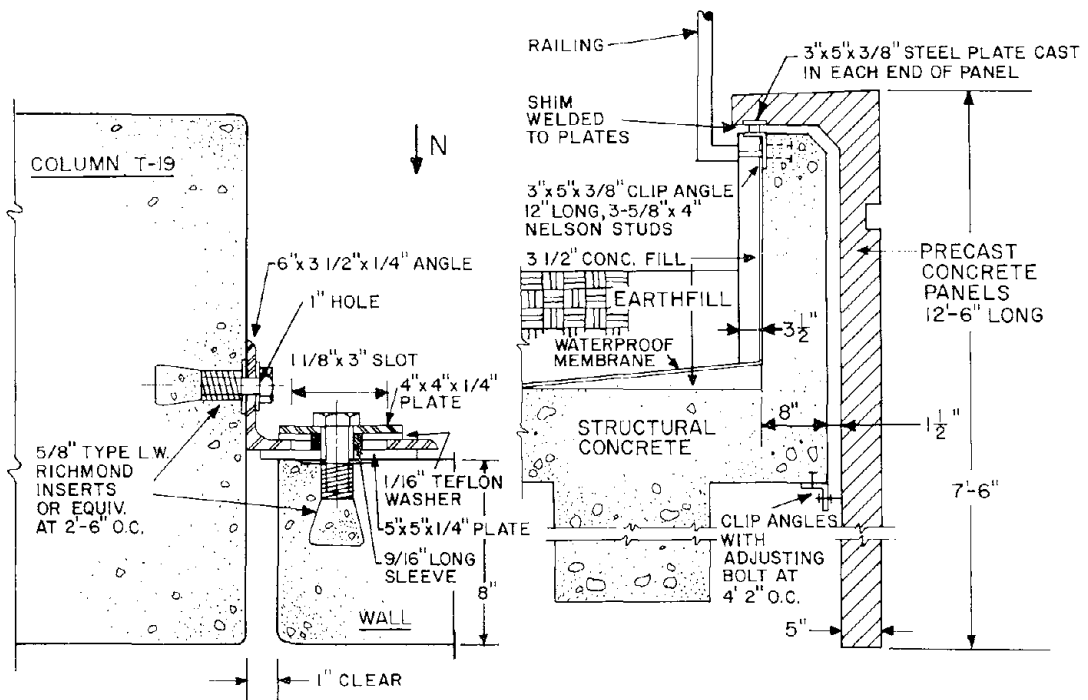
DETAIL OF CONNECTION OF ELEVATOR SHAFT WALLS TO FIRST STORY COLUMNS
